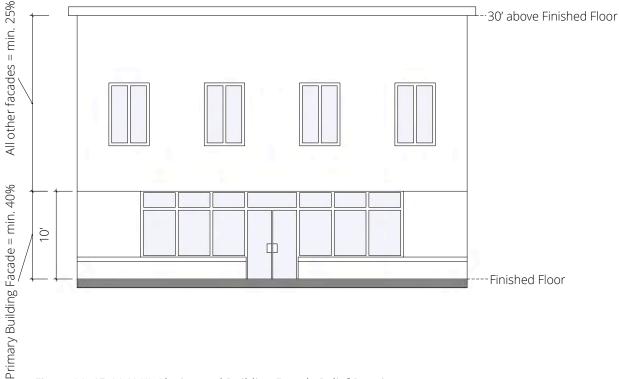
E-8060(1) Glazing and Building Facade Relief Requirements
